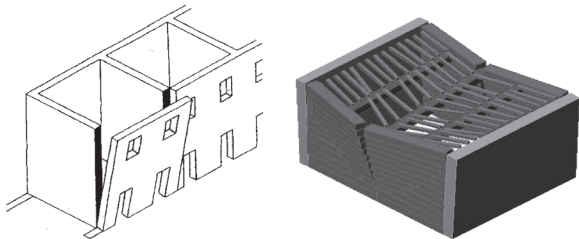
Collapse modes of masonry walls: overturning (left) and horizontal flexure (right).
